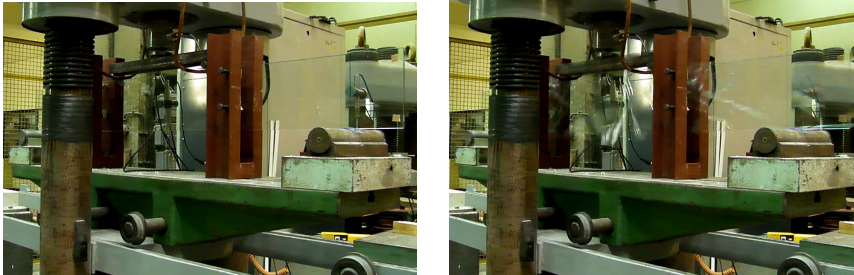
Glass specimen GS.01 in four-point bending (left) and typical failure of specimen (right).
